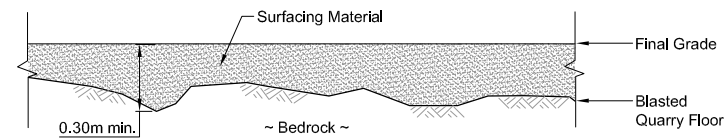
TYPICAL SECTION IN BEDROCK
